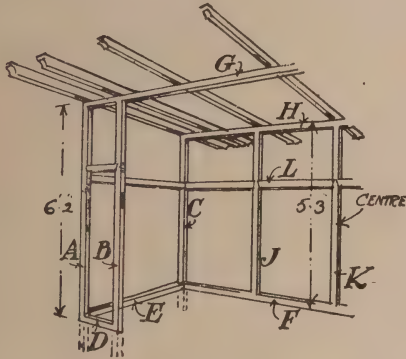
Construction of Frame of Open-fronted Summerhouse
